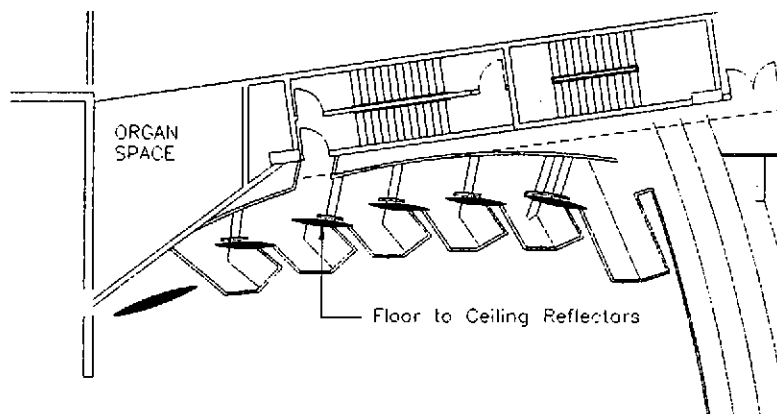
Plan of the proposed Queen Elizabeth Theatre renovation.
